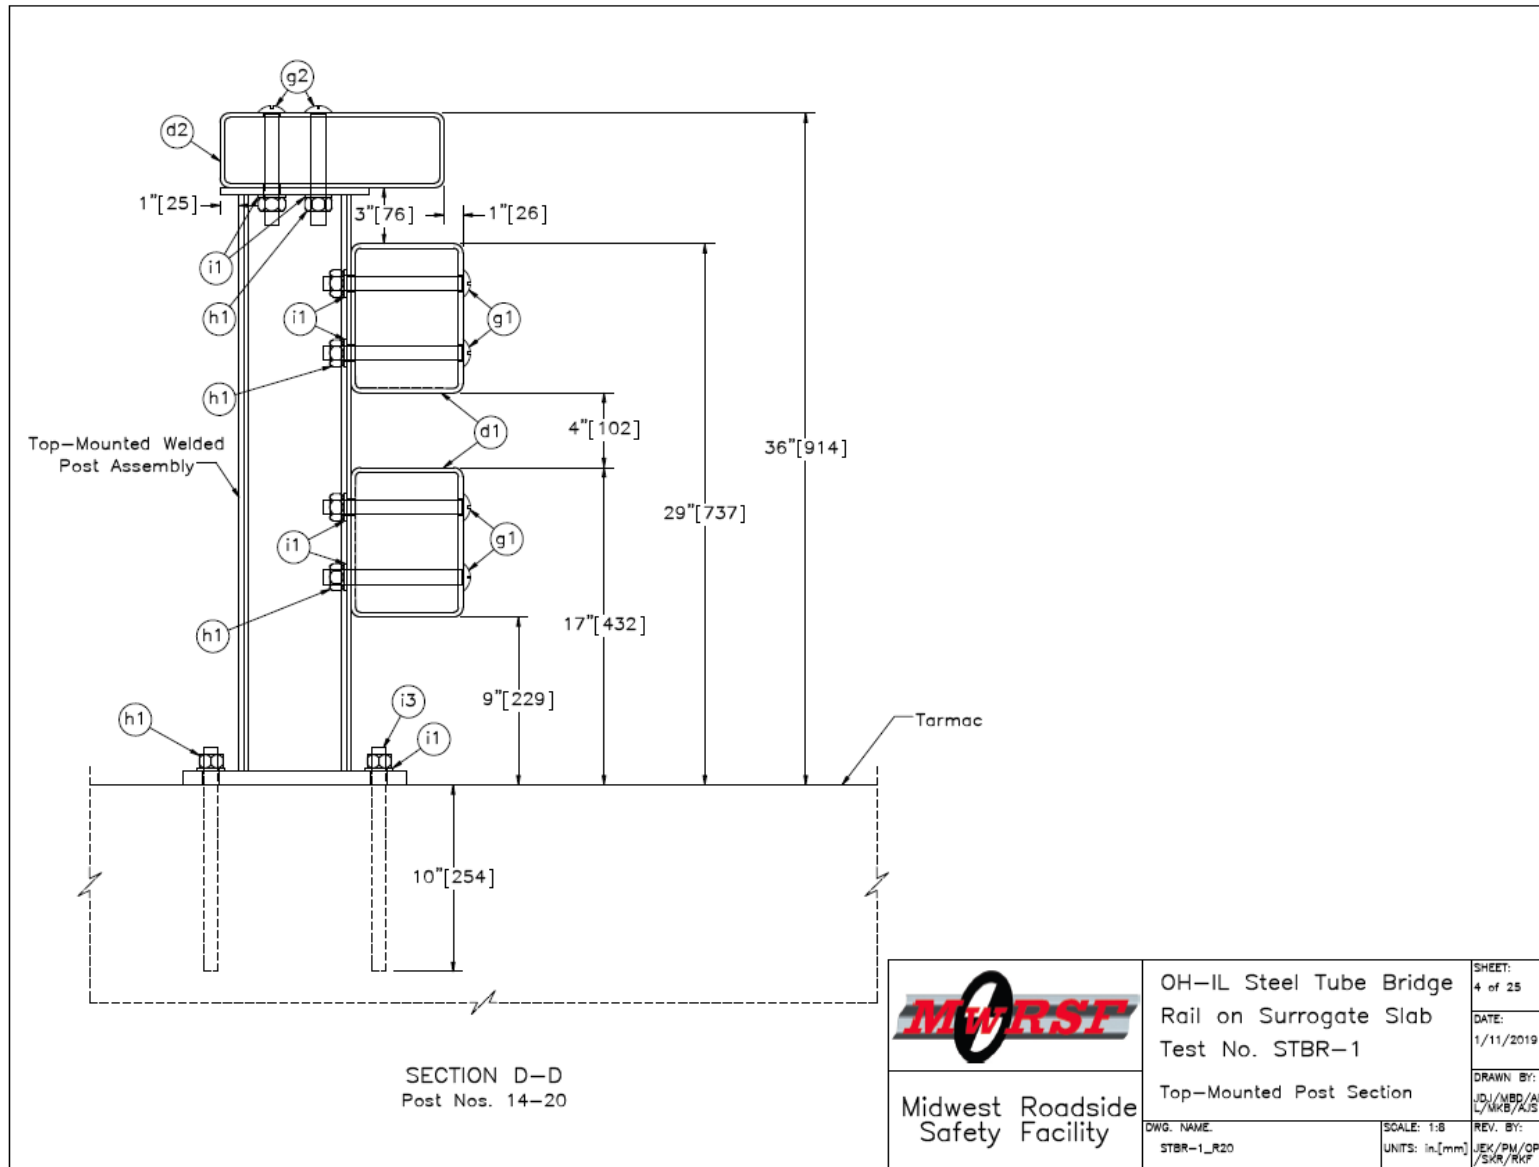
Top-Mounted Post Section, Test No. STBR-1
